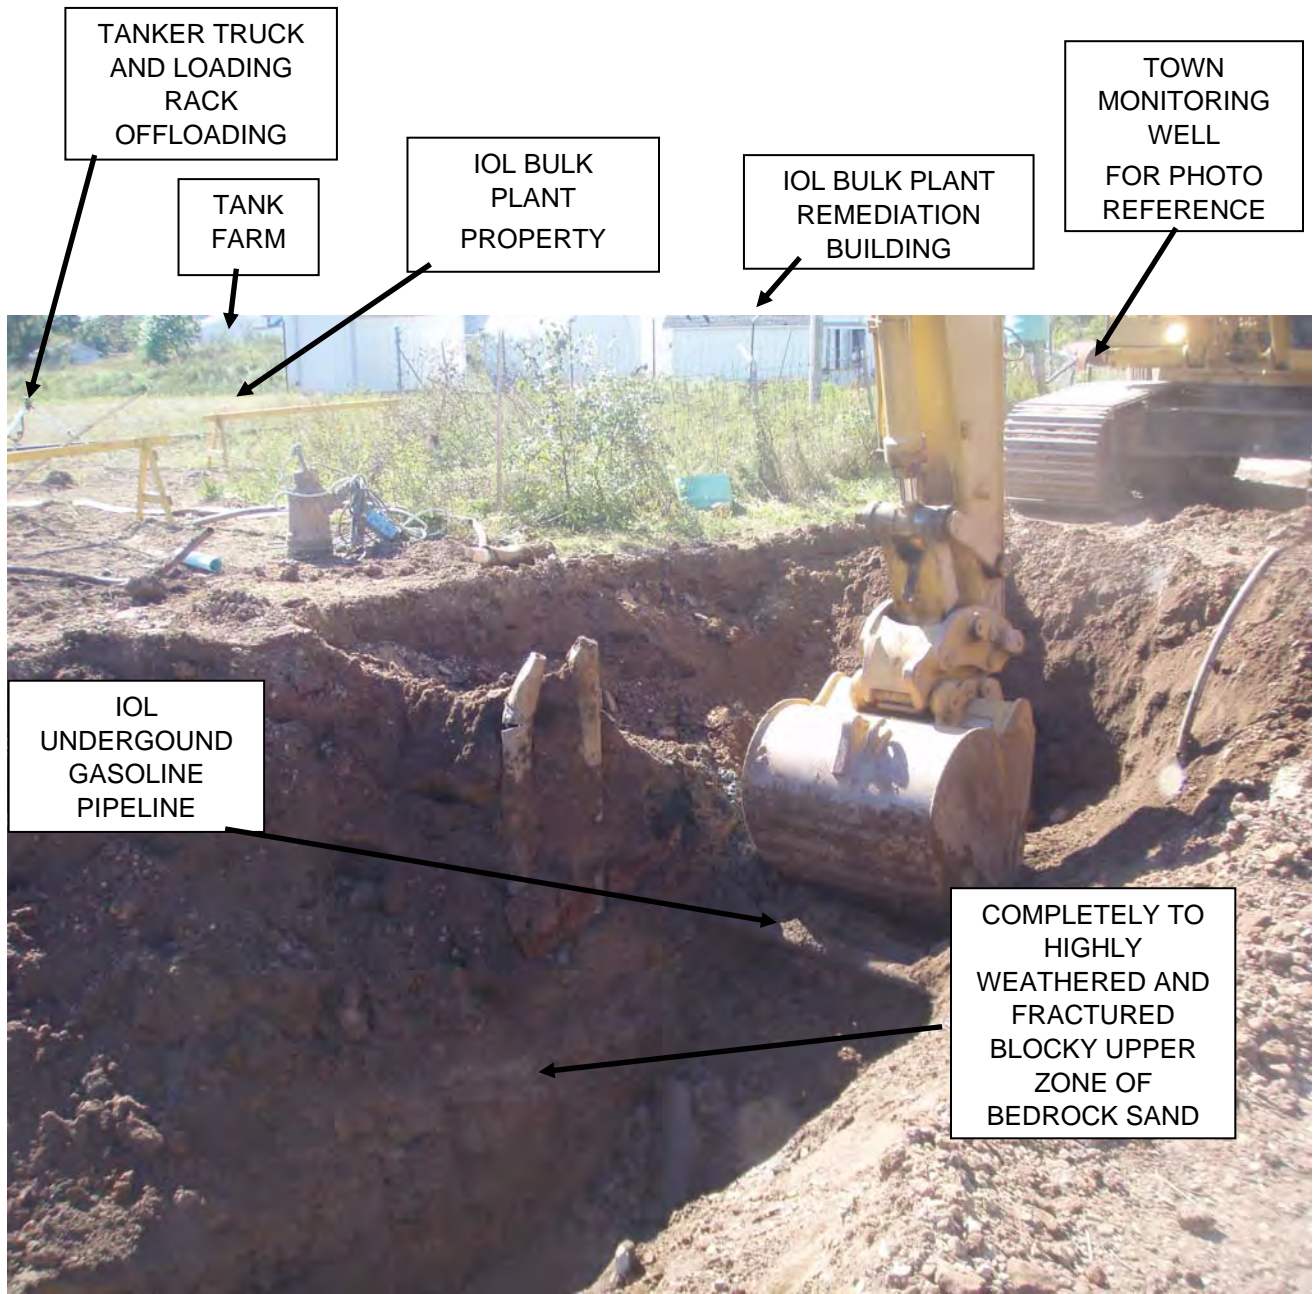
Looking towards IOL site from west side of FN/MEL. Bedrock fracturing and horizontal layering shown is typical.
